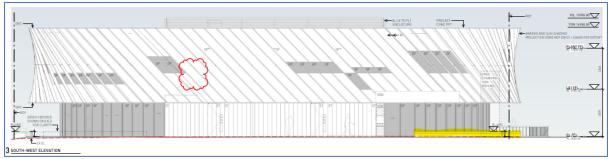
South west elevation plan showing flood deflection wall highlighted in yellow
